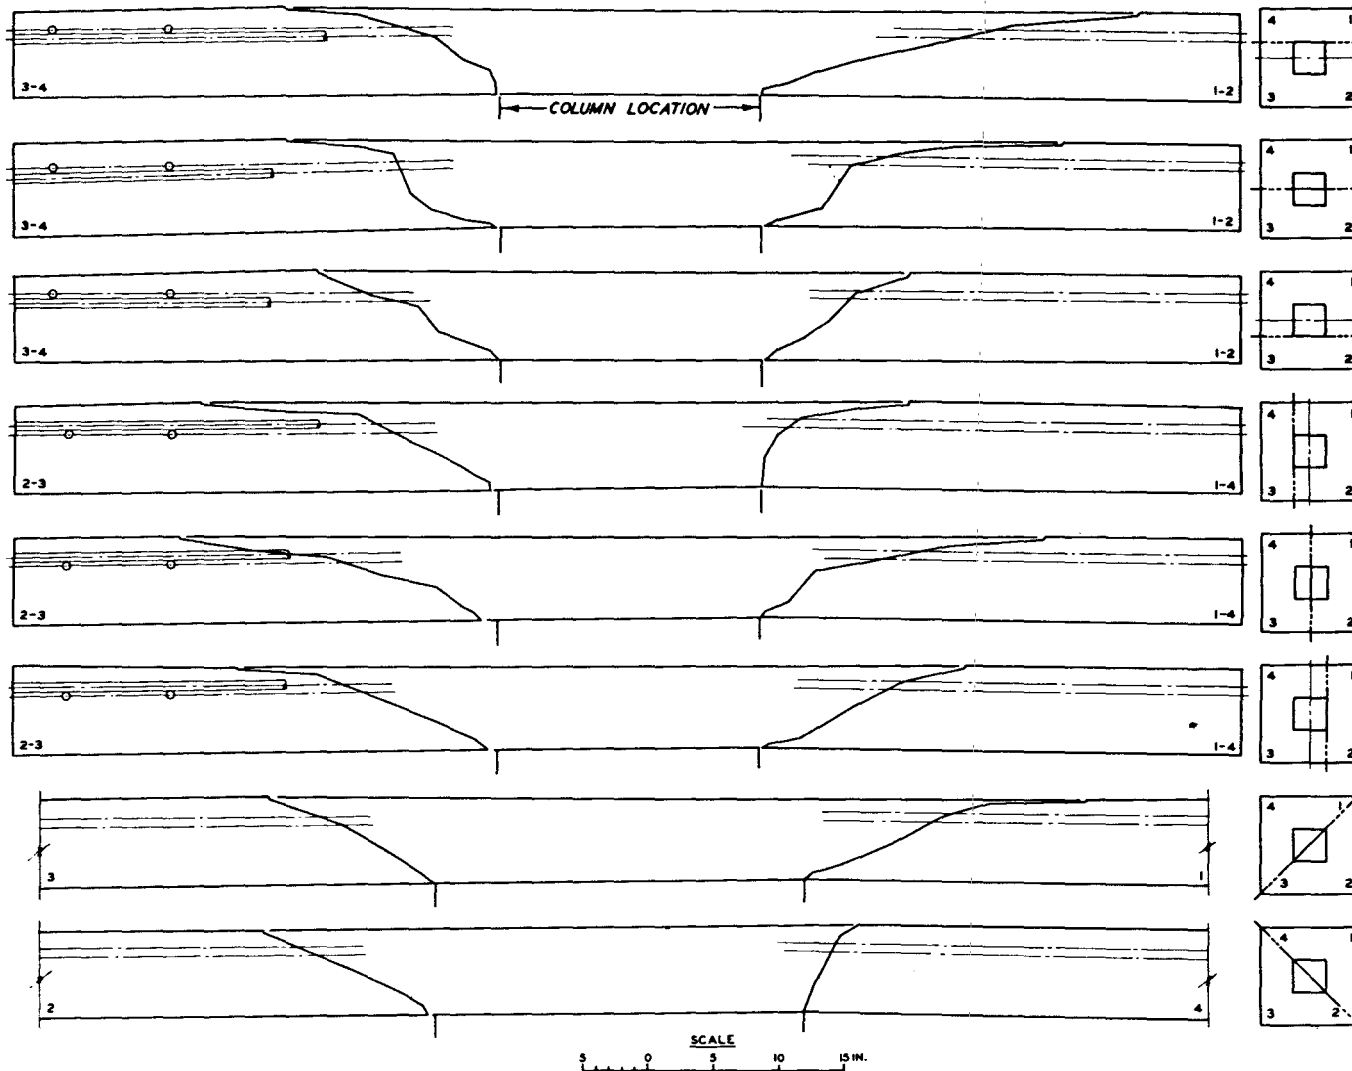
Profiles of slab failure surface, Specimen S4075-1.
